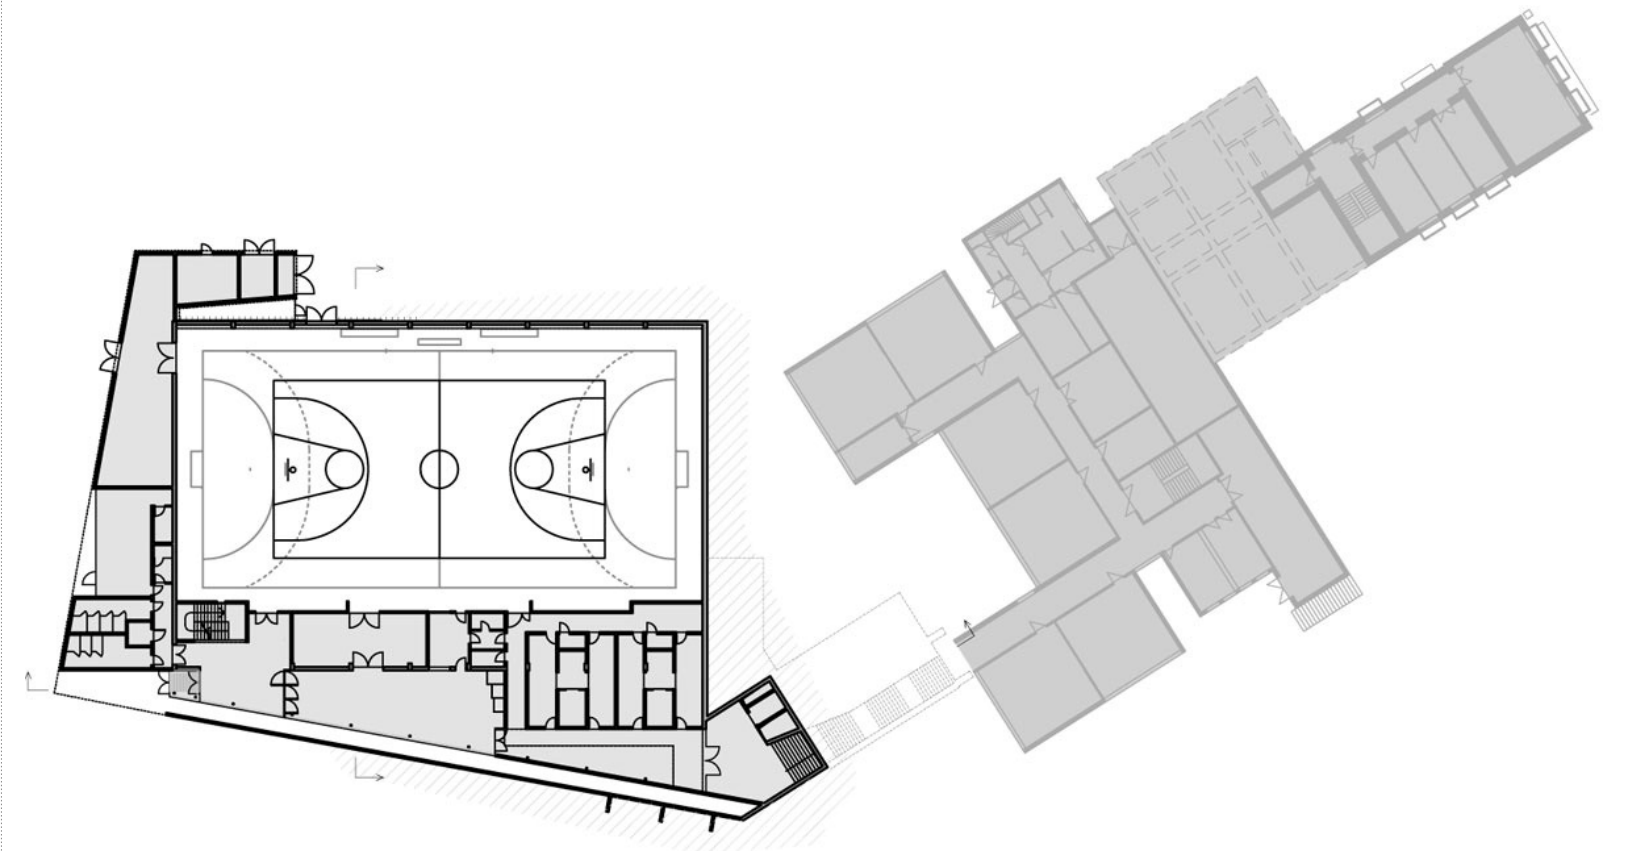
Sports Center Stopiče Plan. Source : ArchDaily
